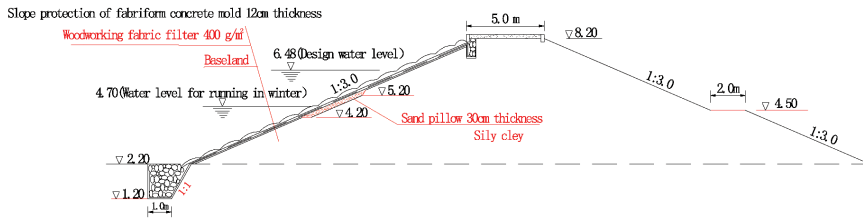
The standard cross section of slope protection of Da-Wa Delta-Plain reservoir using fabriform concrete.
